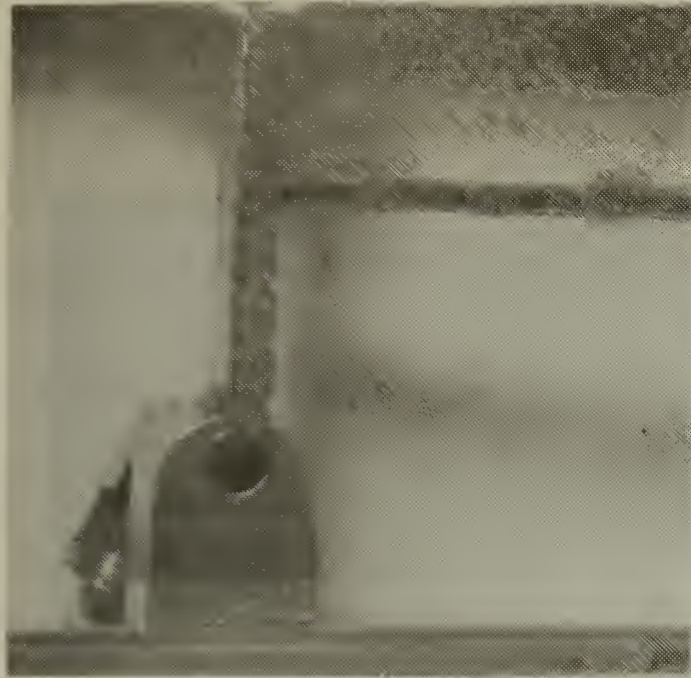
DETAILS OF WINDOW VACUUM MANIFOLD
